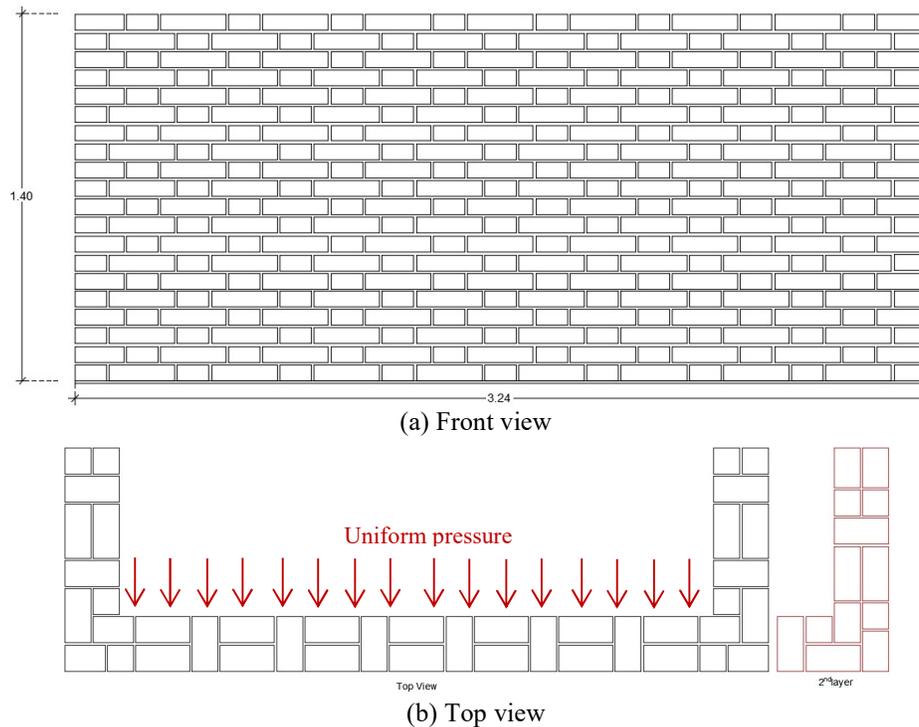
Initial planned configuration for the U-shaped URM masonry walls.
